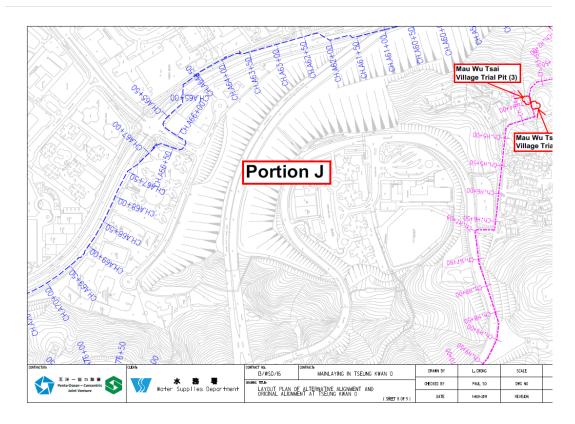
Location Plan for Mau Wu Tsai 2 & 3
